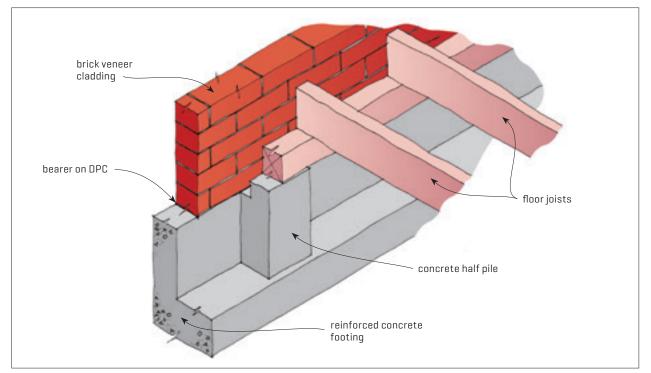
Suspended floor structure with semi-detached or half piles integrated into continuous foundation wall.
